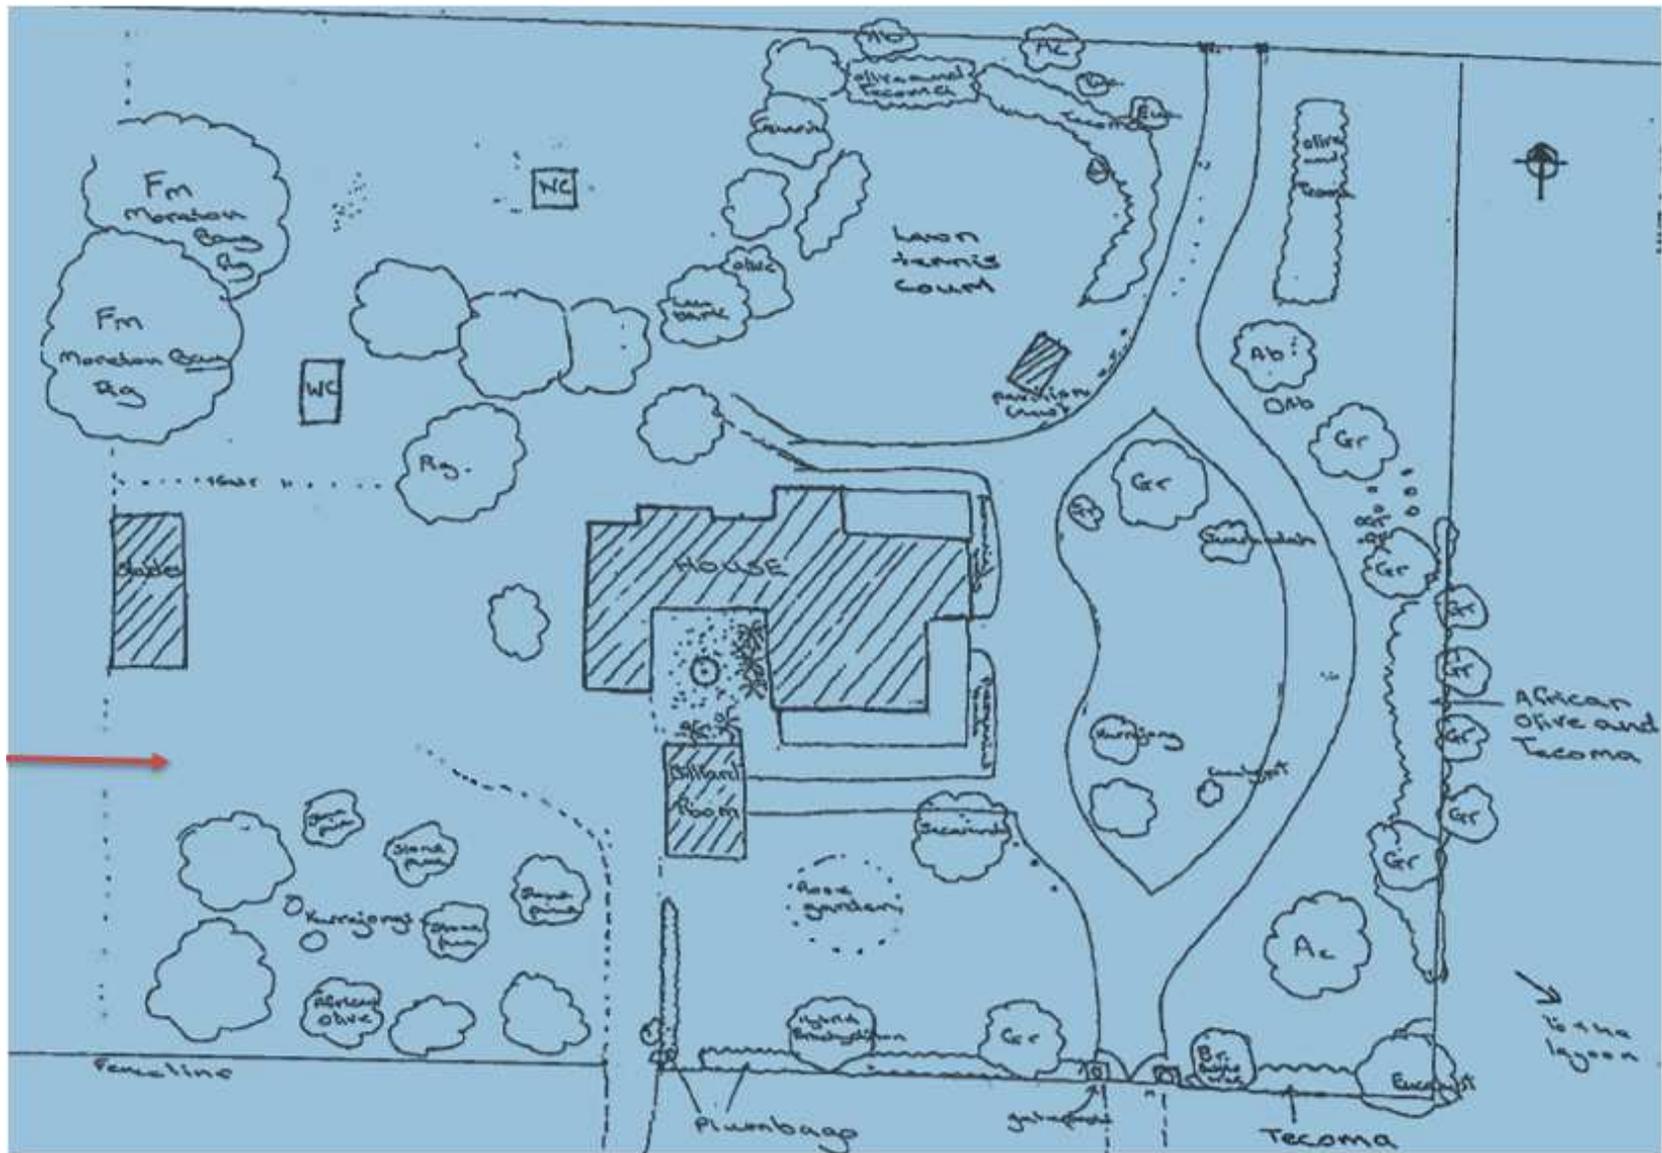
Sketch plan indicating layout of Anambah House and gardens. Red arrow indicates current access point (Source: National Trust listing, 1983)
